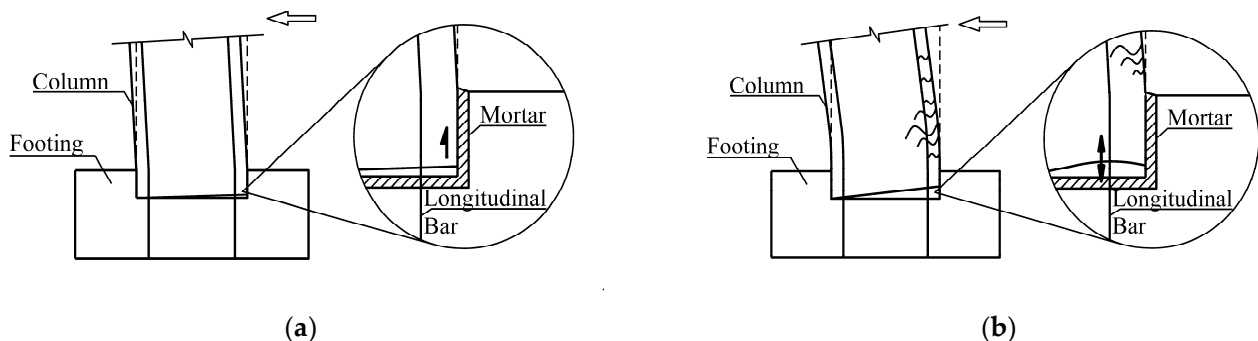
Schematic diagram about deformation in the precast pier with recess: (a) Initial state; (b) Severely cracked.
